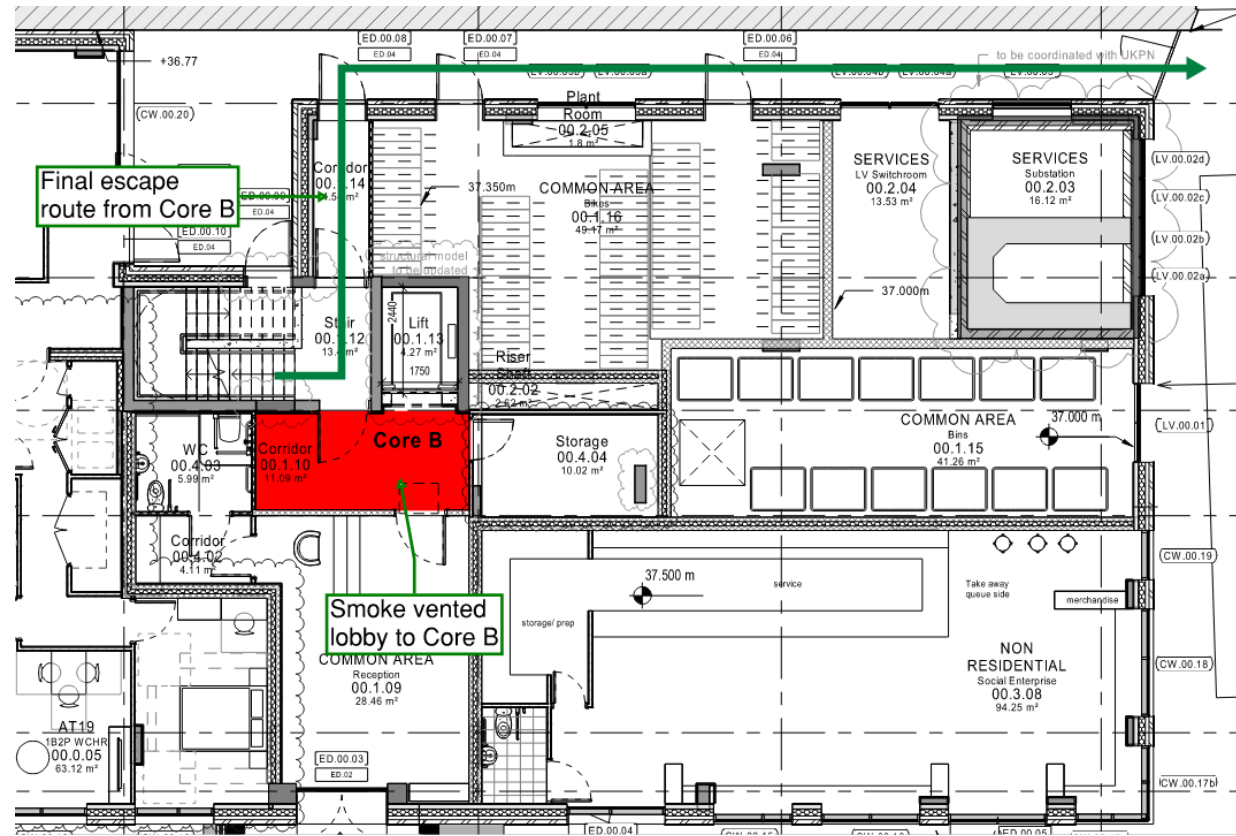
Final Escape Route from Core B at Ground Floor Level
